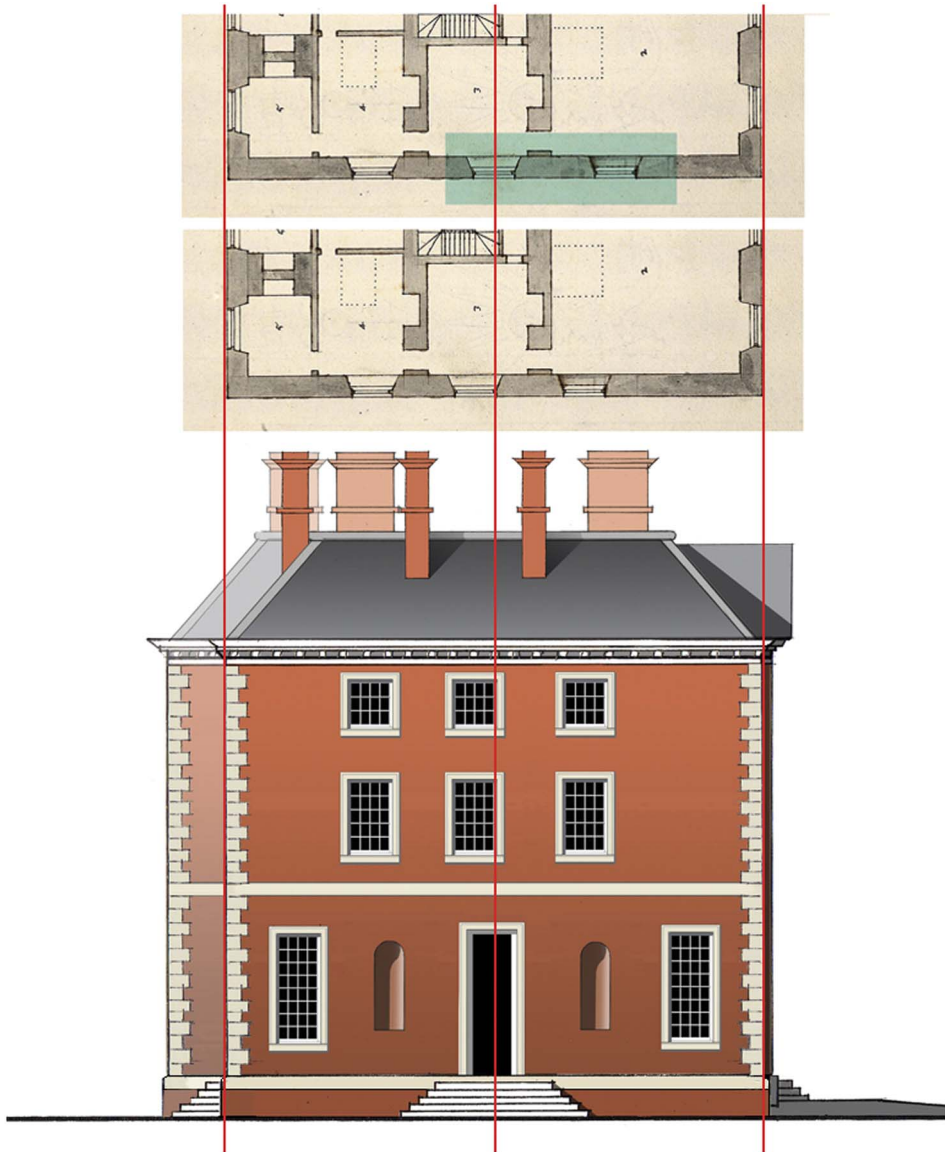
Moor Park: conjectural reconstruction of the south elevation drawn with the upper windows off-centre, exactly as indicated on the plans of 1687, with a detail of the plan as drawn and the same detail amended to show the probable intended arrangement with the 'corrected' area highlighted in blue. *Drawings*: David Wrightson
